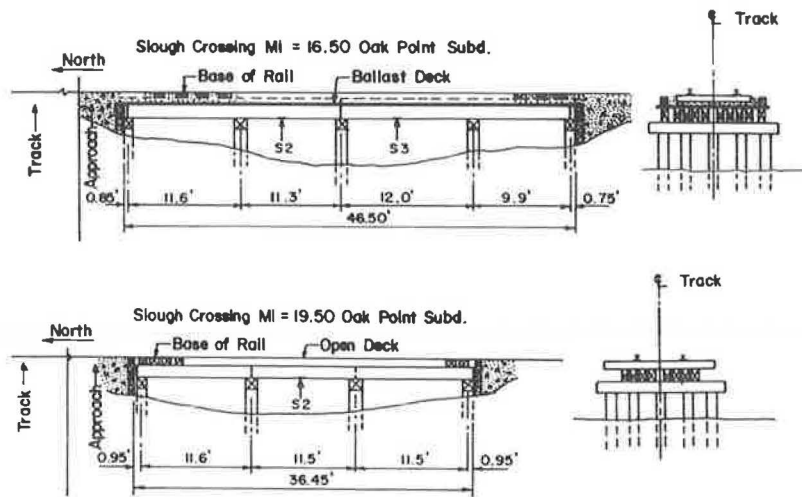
First test bridge—ballast deck (top); second test bridge—open deck (bottom).
